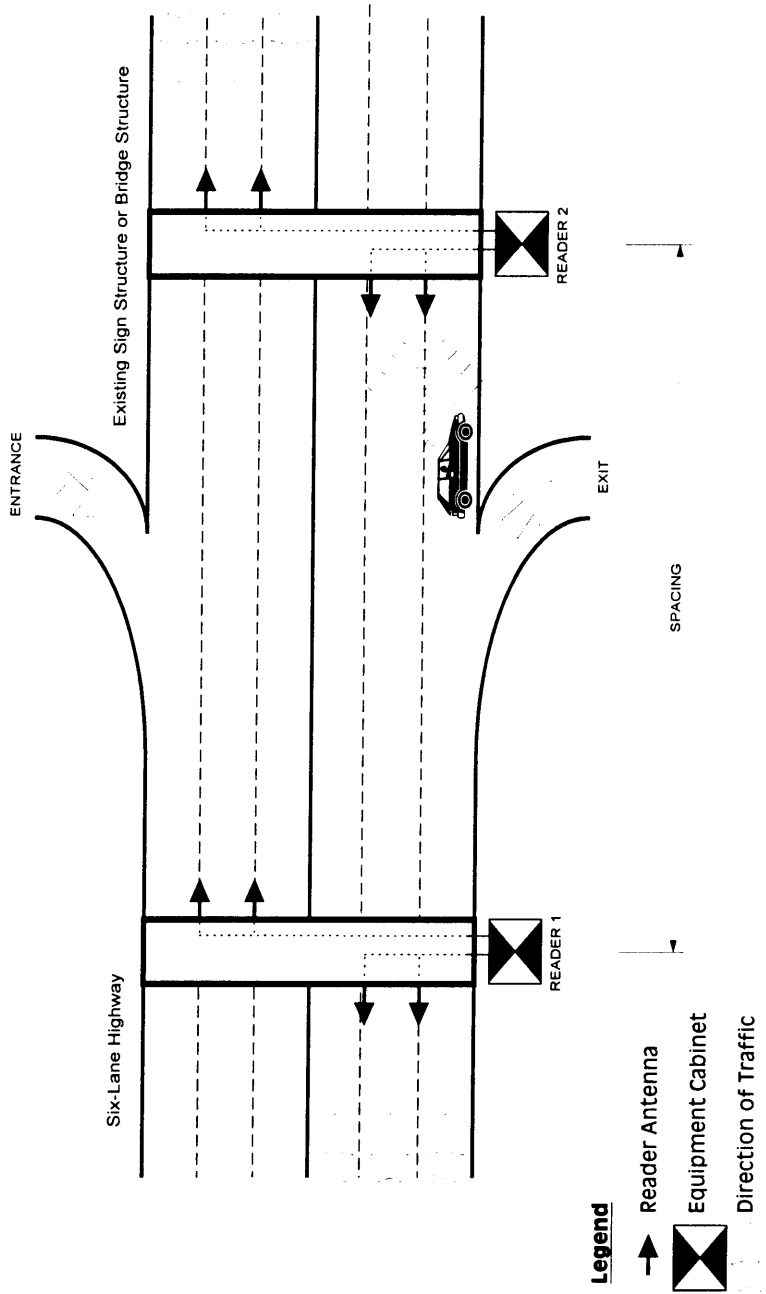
Two Typical TRANSMIT System Road Site Terminal (RST) Locations on a Six-Lane Highway
